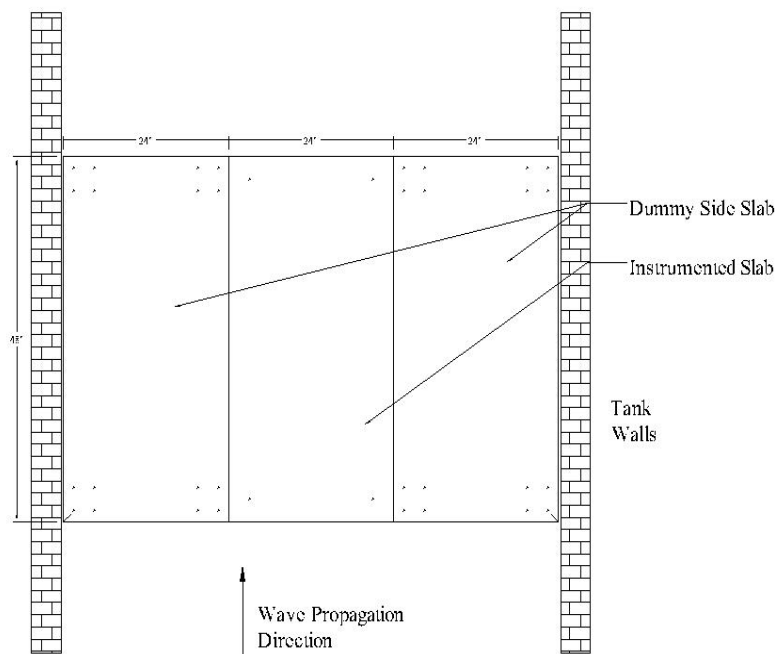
5 Plan view of instrumented section and two rigid side panels.
